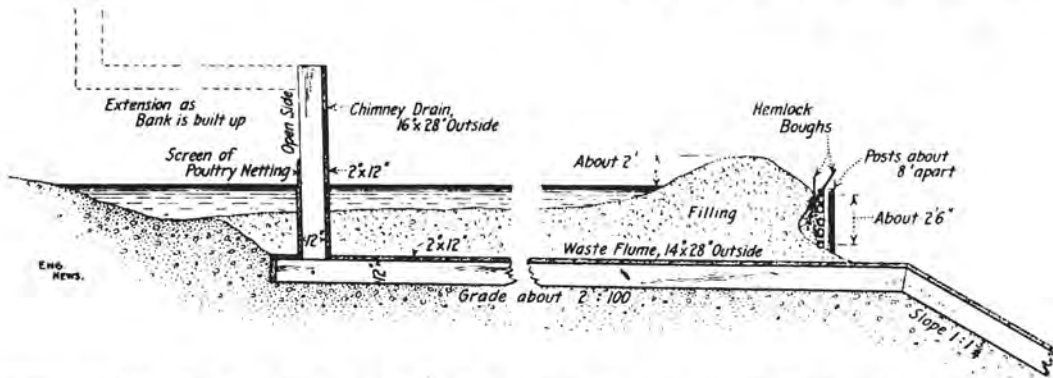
ARRANGEMENT OF BOX DRAINS AND "CHIMNEYS" FOR CARRYING OFF WATER FROM SETTLING POOL ON TOP OF HYDRAULIC-FILL BANK.
